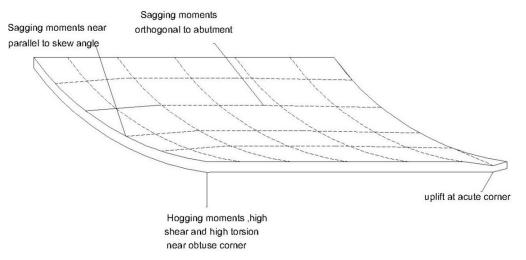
Behaviour of Deformed shape of PSC T Beam girder with deck slab
